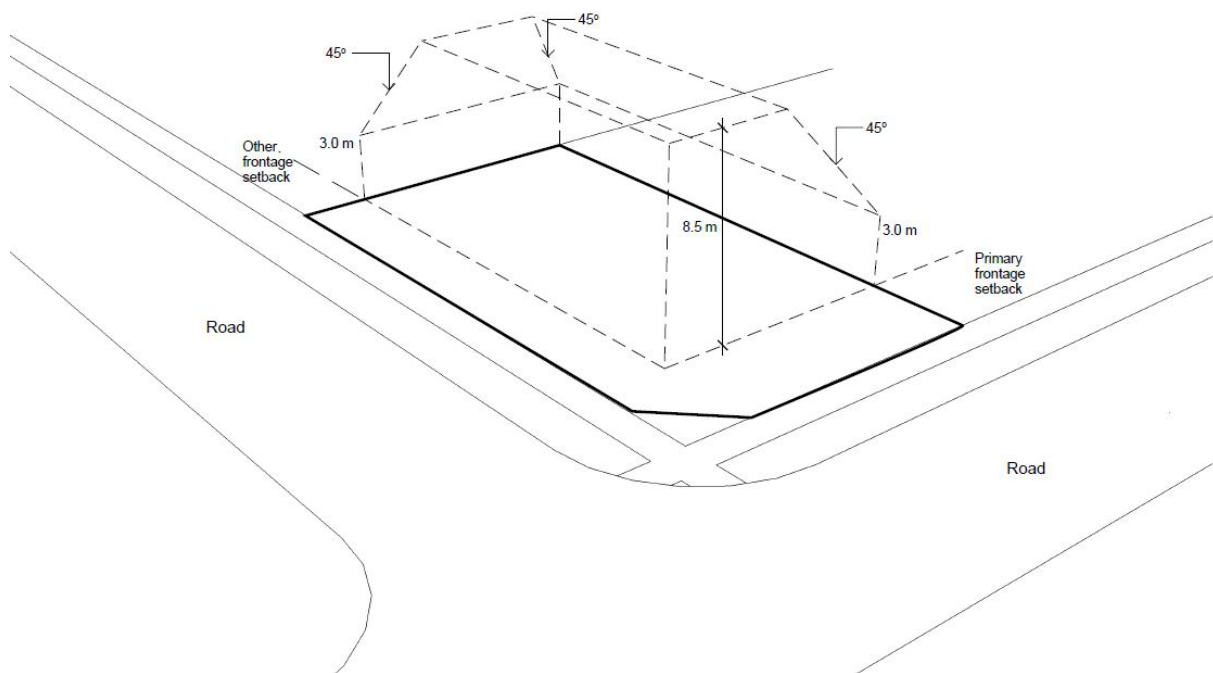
Building envelope for corner lots as required by clause 10.4.2 A3(a)
